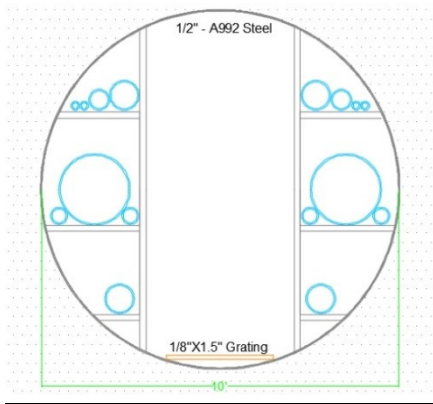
Cross-section of steel tunnel (BYU, 2015)
